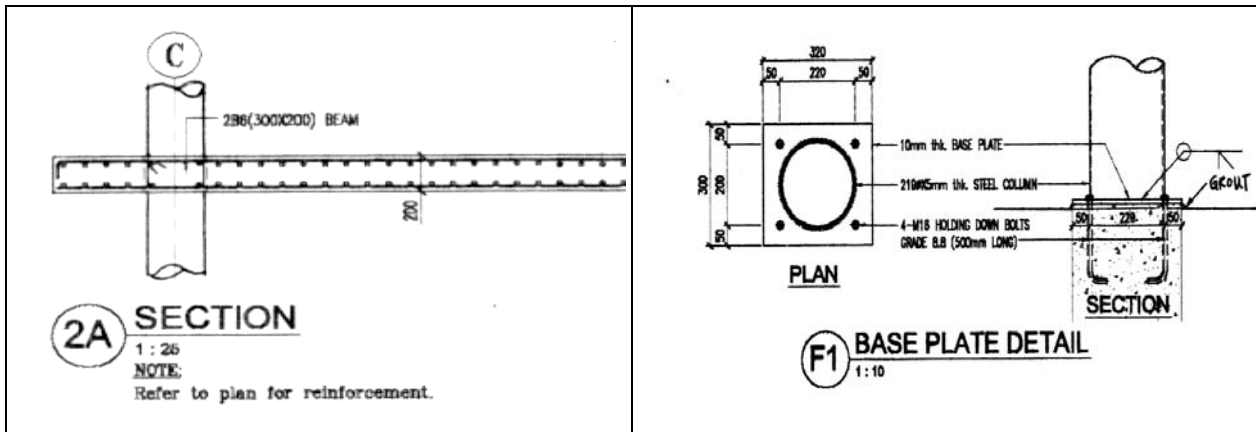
Hidden beam within column strip Figure 5.5 Base plate details for column
